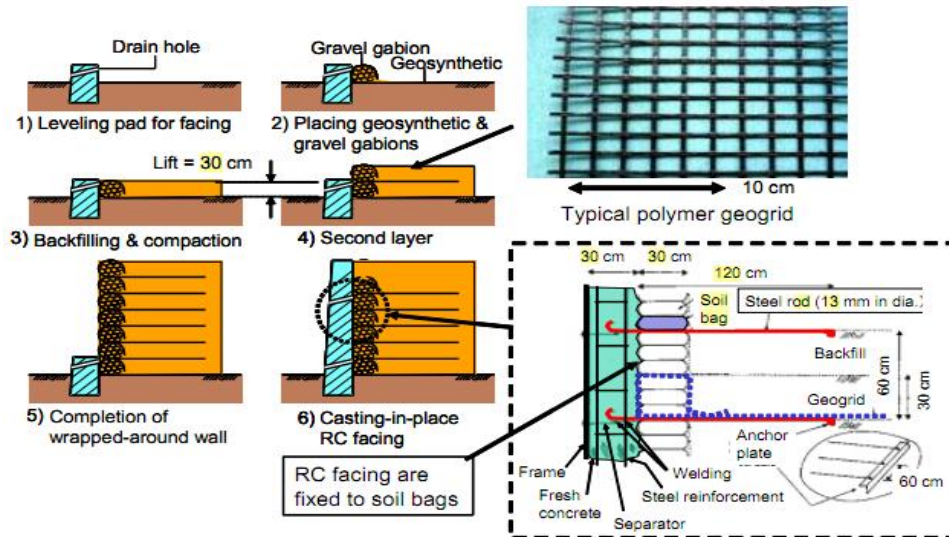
Staged construction of GRS RWs with a FHR facing
